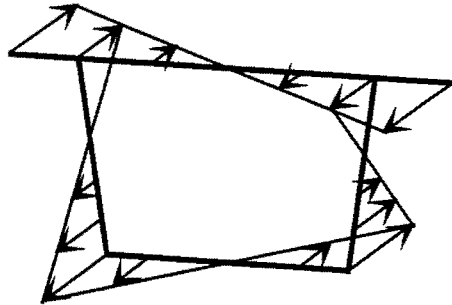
Distortional Warping Stresses on Box Girder Cross-Section
